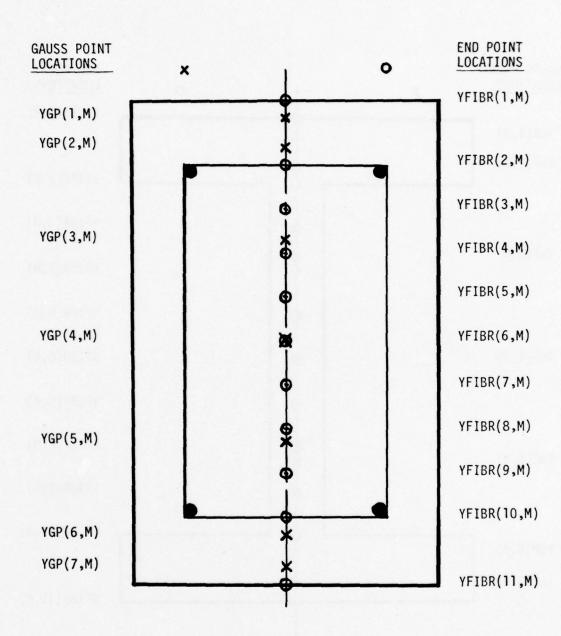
GAUSS POINT AND END POINT LOCATIONS FOR A REINFORCED CONCRETE SECTION.
